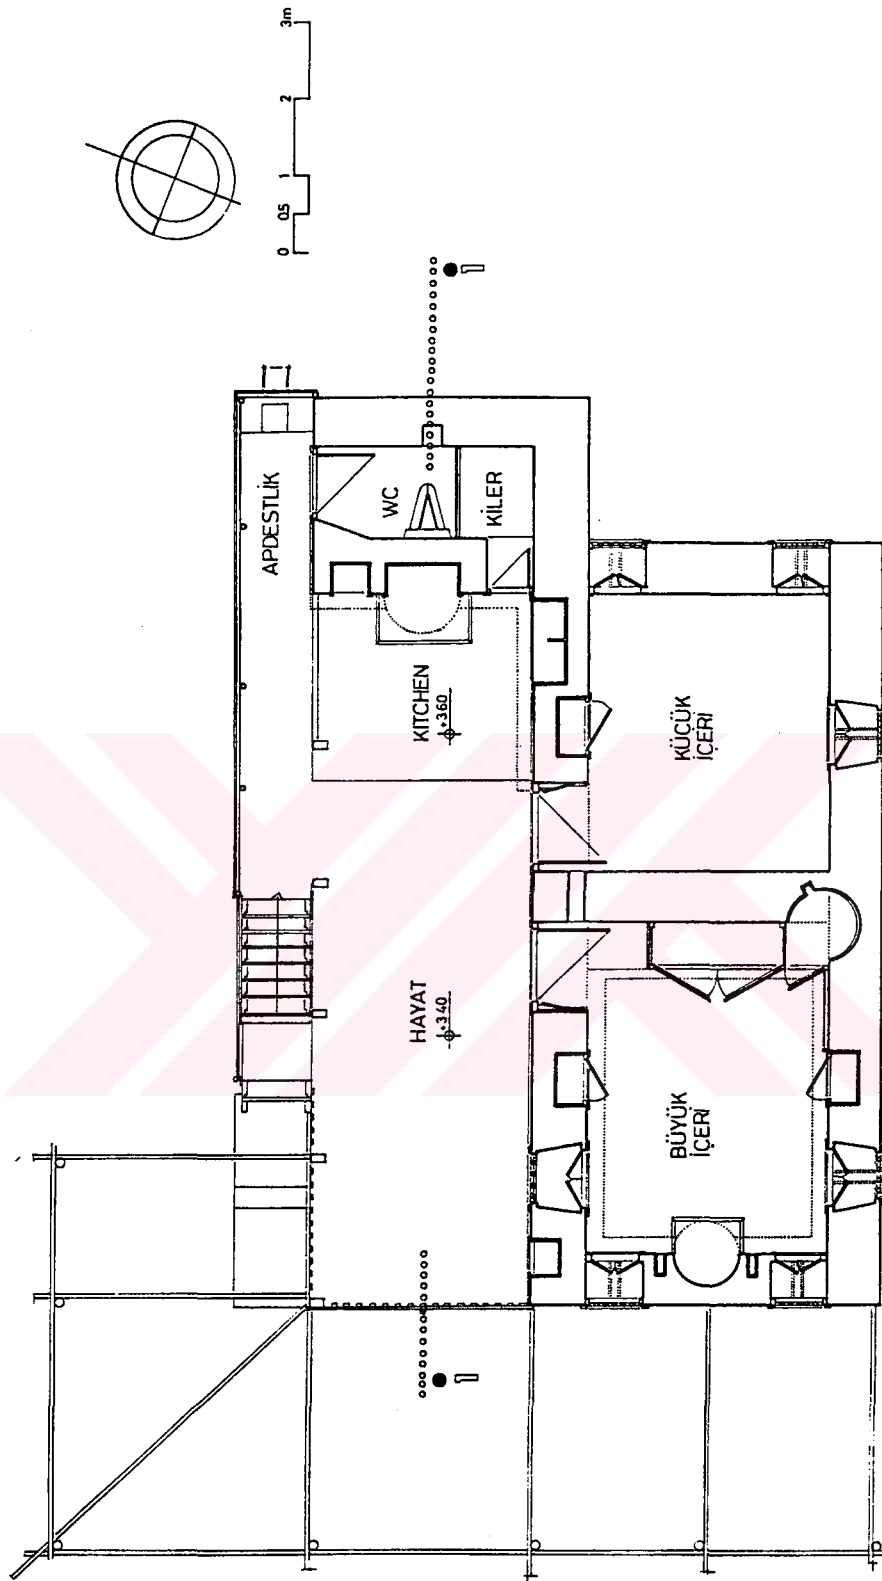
First floor plan of Hacı Hüseyinler House.
